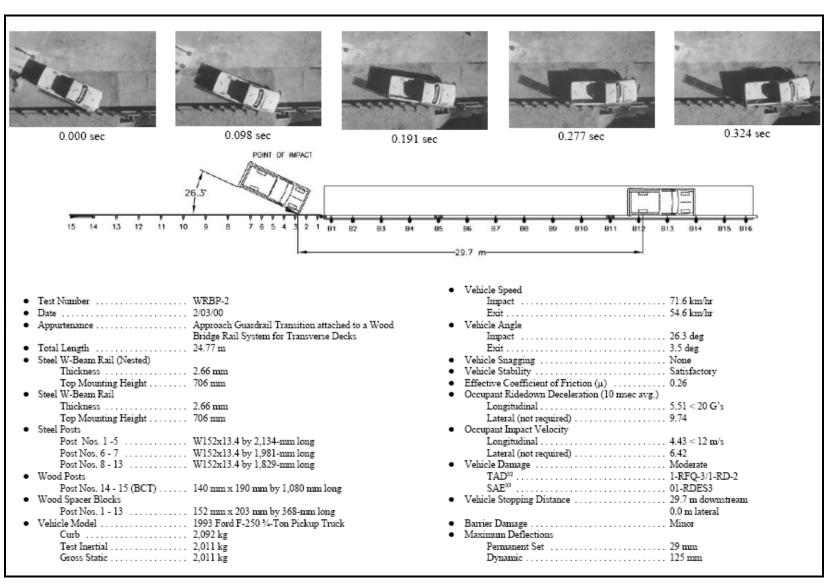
FPL Glulam Bridge Rail TL-2 Test 2
